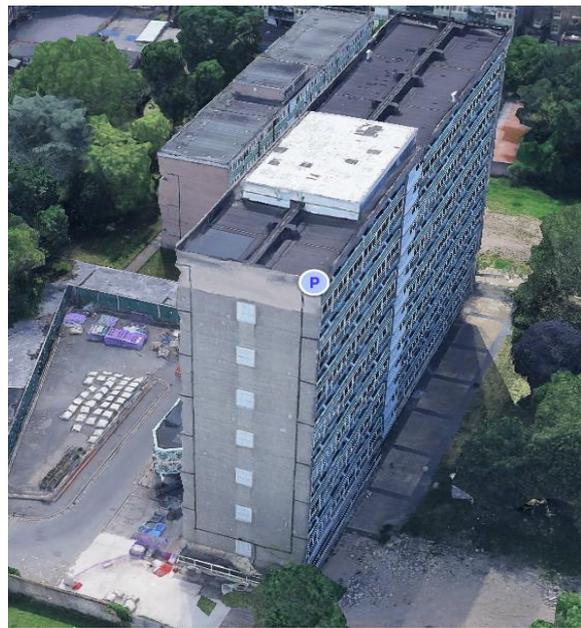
Capture from Google Earth showing the Southeast facing side of the roof.
